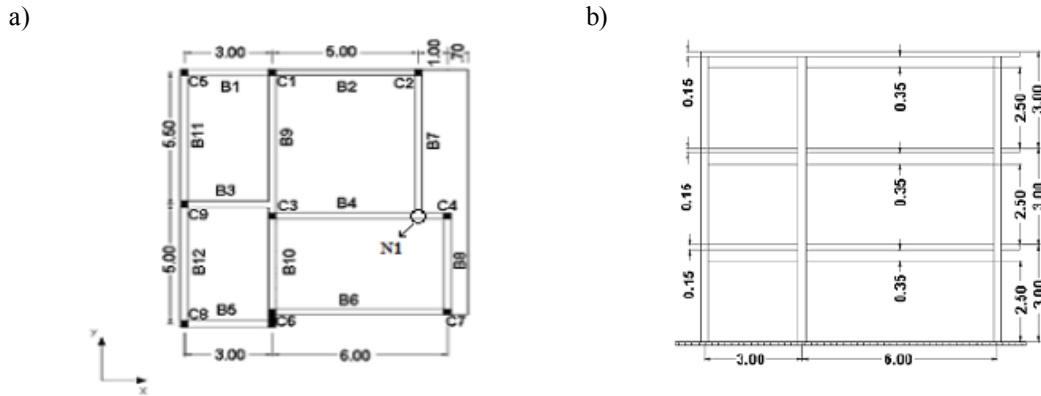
SPEAR building: a) Plan View; b) Lateral View
